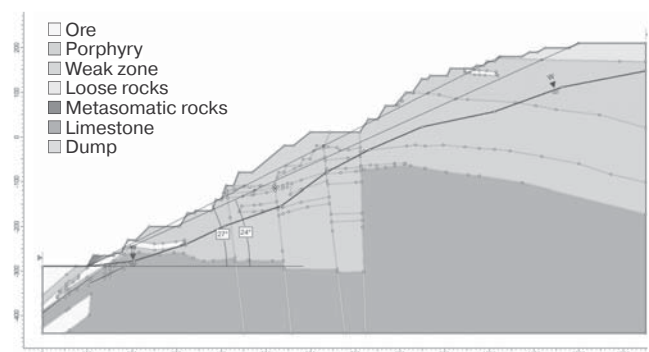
Elevation view along profile 6 (weak zone in NE pit wall)
